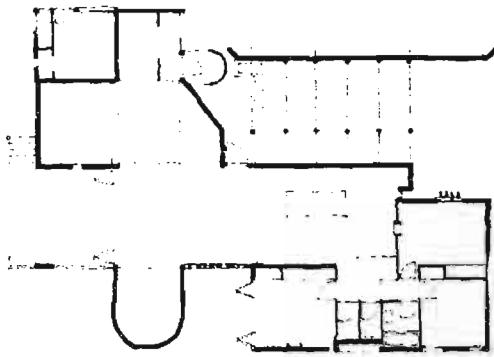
P. Mikula – House Shoba (1968) Plan.
